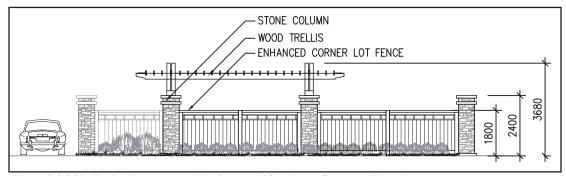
Typical treatment at Northeast and Southeast Corners - Elevation
